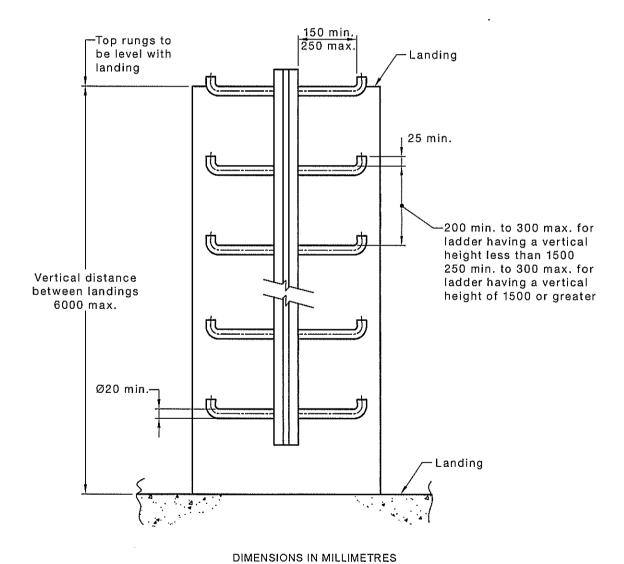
PRINCIPAL DIMENSIONS OF SINGLE-STILE RUNG-TYPE LADDERS
